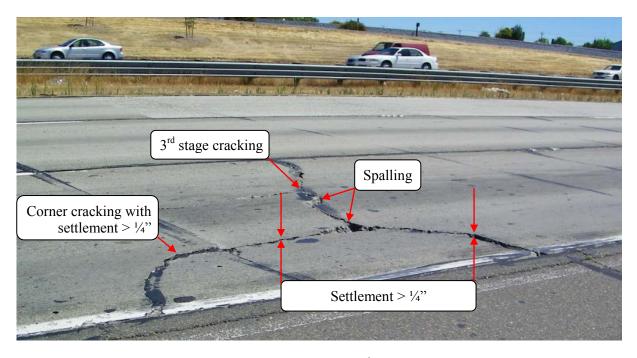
Replace slabs and base – corner and 3^{rd} stage cracking with settlement > $\frac{1}{4}$ "
